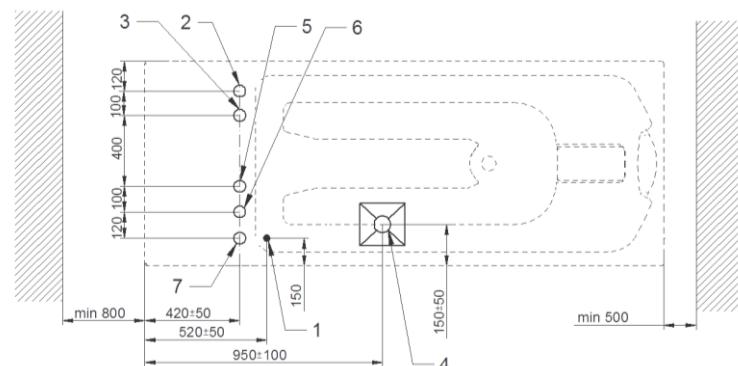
ORIONMED Balneo bathtub layout of media outlets in the floor (dimensions in mm)
